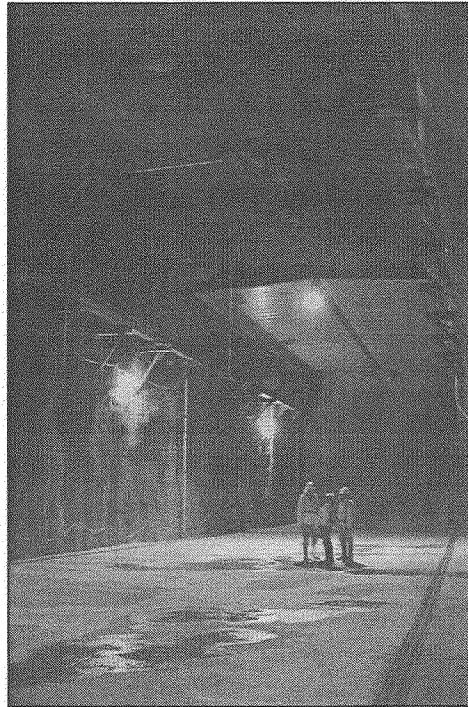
MINOS Hall shotcrete lining and drip ceiling.
